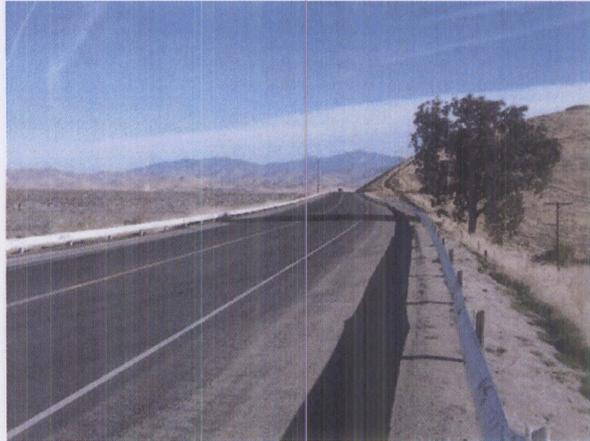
Metal beam guardrail (MBGR) Segments 1 and 2 at western portion of the project area
